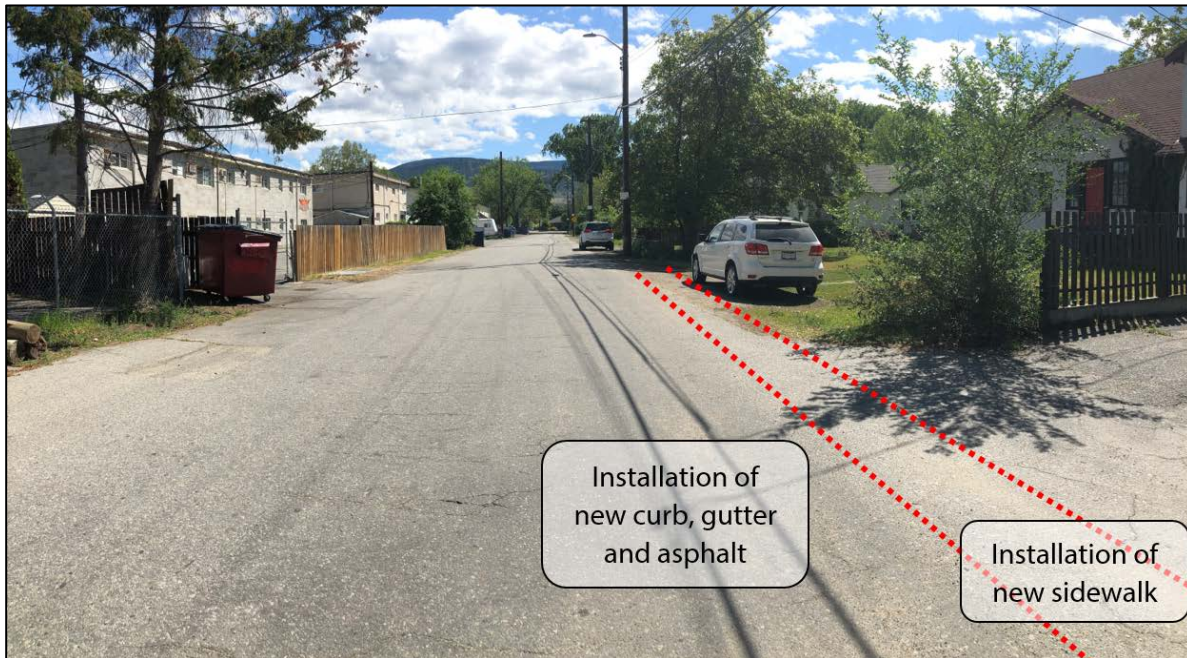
Looking east along Churchill Avenue, which will receive new asphalt, curb, gutter and sidewalk on the south side of street
